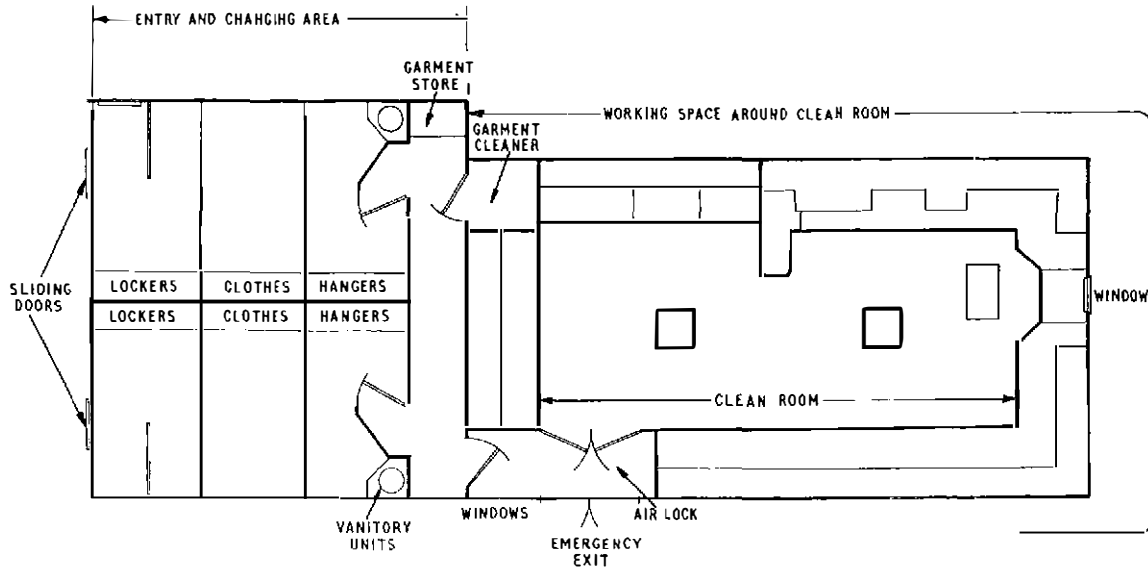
PLAN OF CHANGING AREA AND CLEAN AREA
